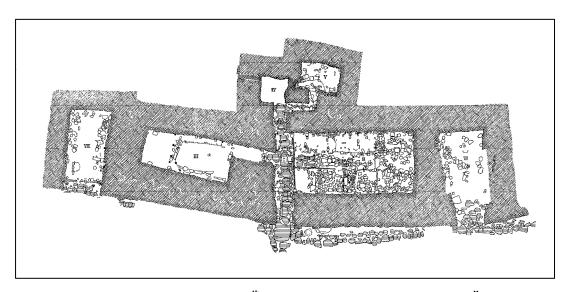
A ground plan of a 14th century farm house at Gröf in Öræfasveit, south-east Iceland. (Ágústsson in Jóhansson 1987, 240).
